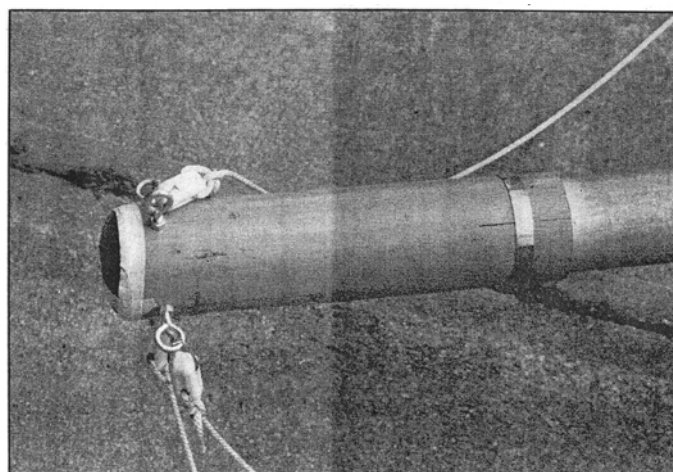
Upper protective pipe with a cap to keep out the elements and birds.
